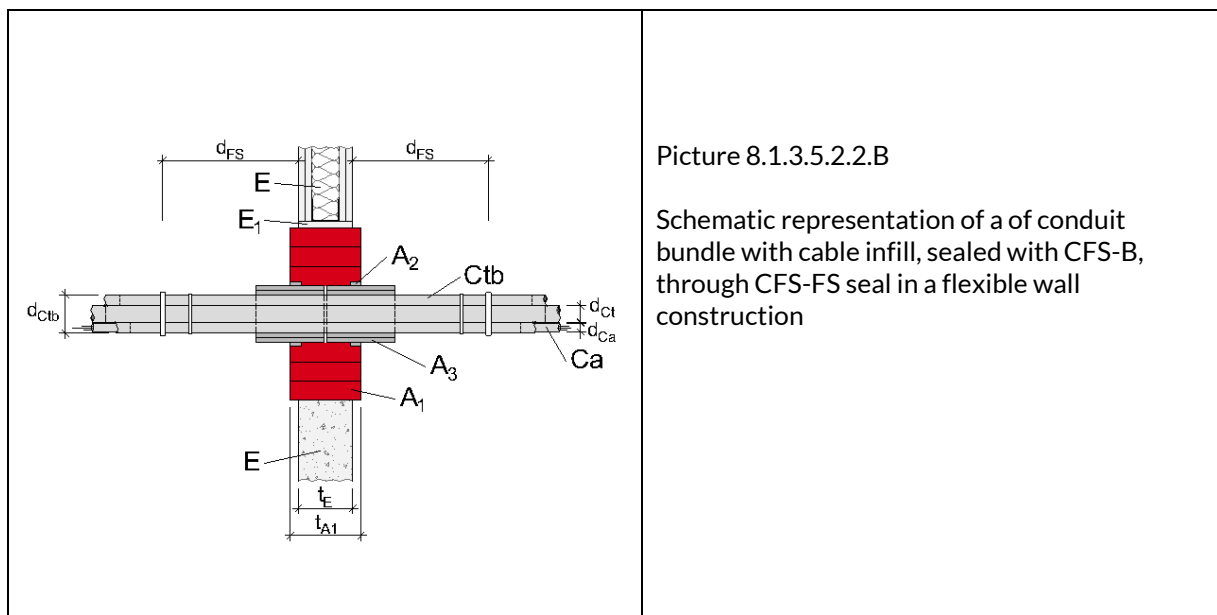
Single conduit and conduit bundle penetration, sealed with CFS-B, through CFS-FS seal
